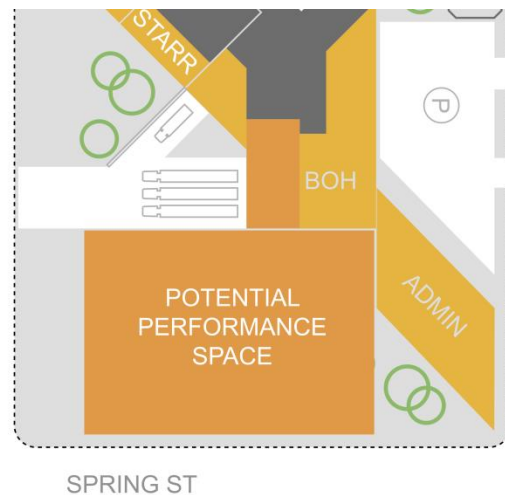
Theater Site Sketch with East and South Screening and Liner Buildings
